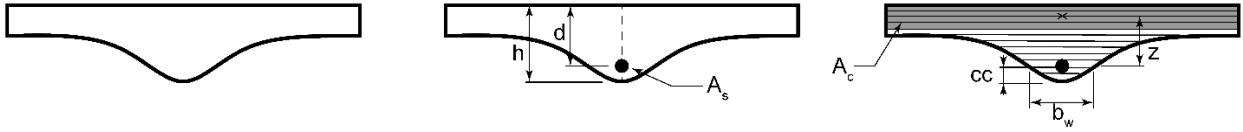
General locations of the area of steel reinforcement and concrete area acting in compression (adapted from Ismail, 2019).
